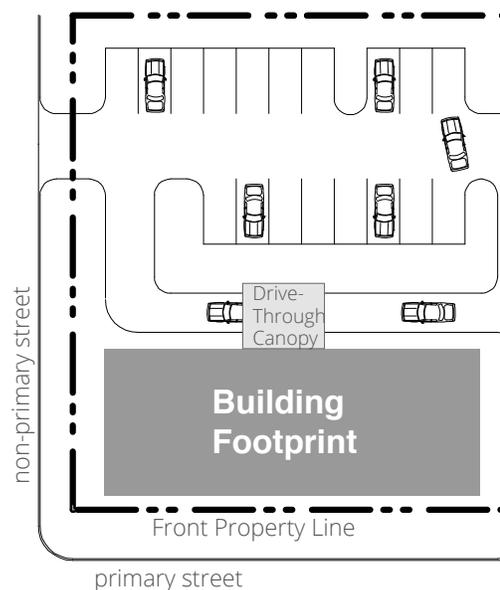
Recommended Drive-Through Facility Layout.
